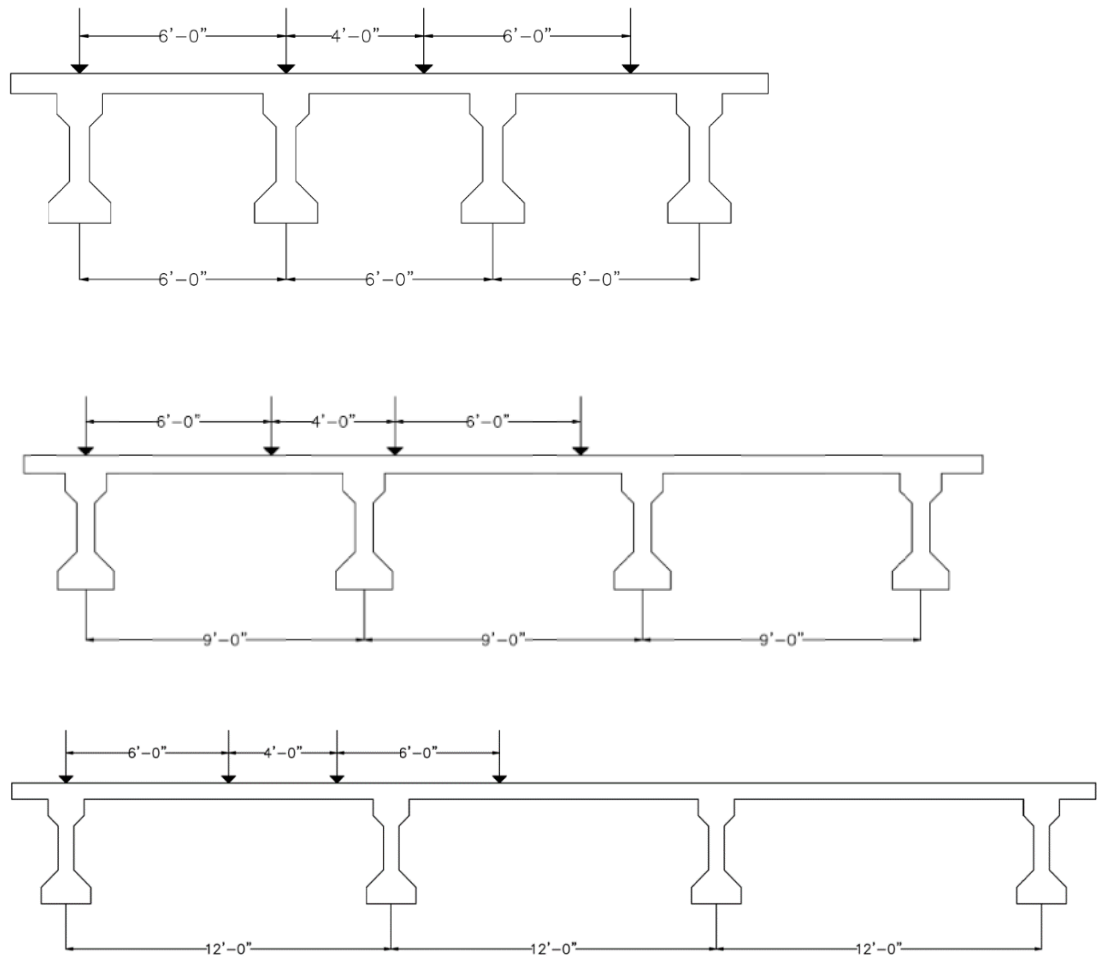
Critical Location of Design Truck for Exterior Girder, Two Lanes Loaded Case
